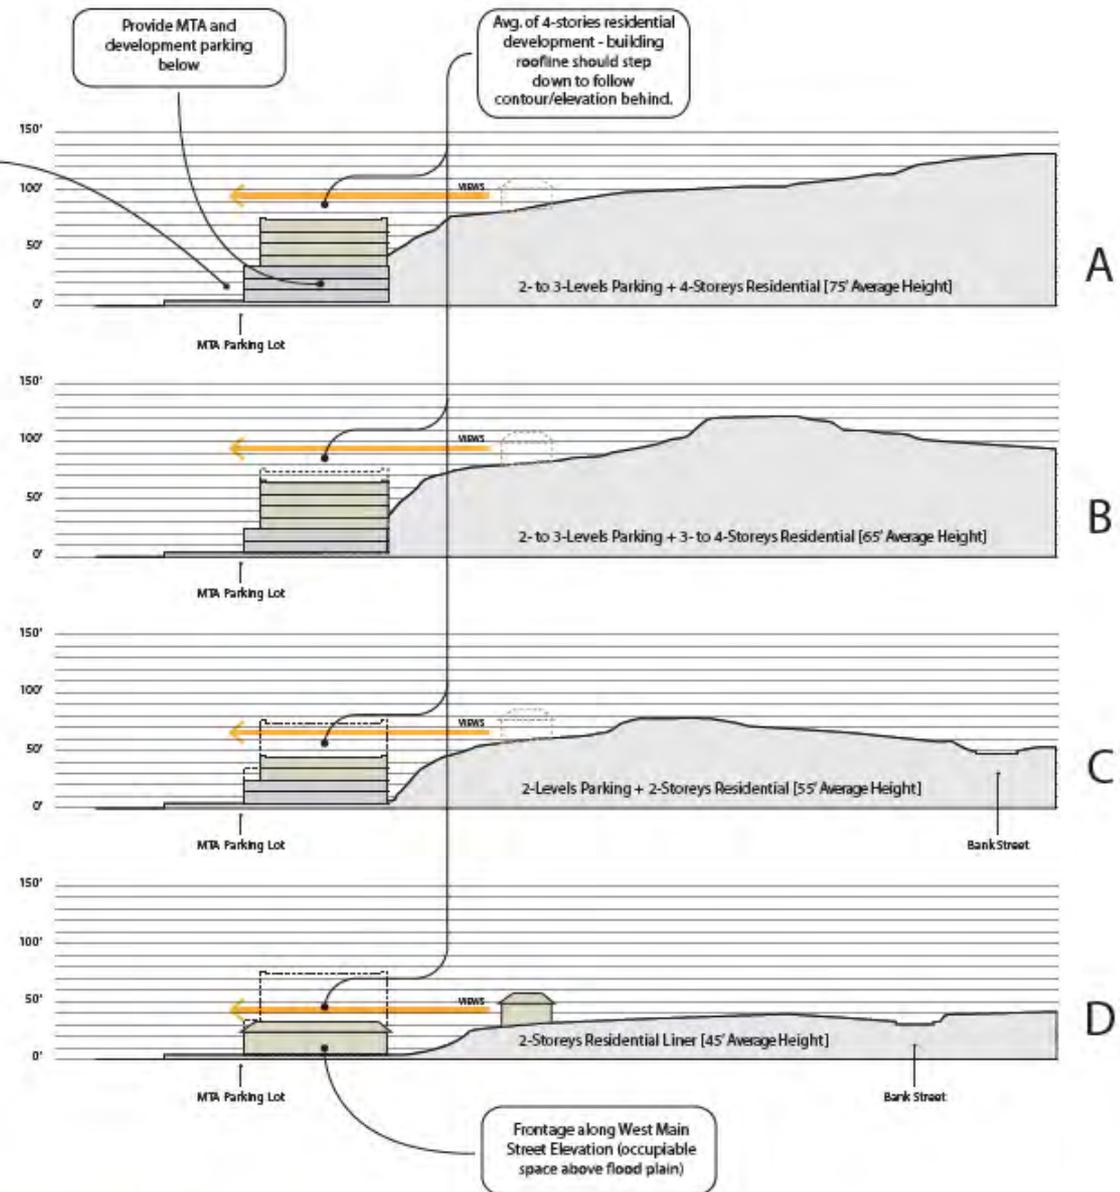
WATERFRONT/STATION AREA DEVELOPMENT PROFILE (NORTH SITE)
